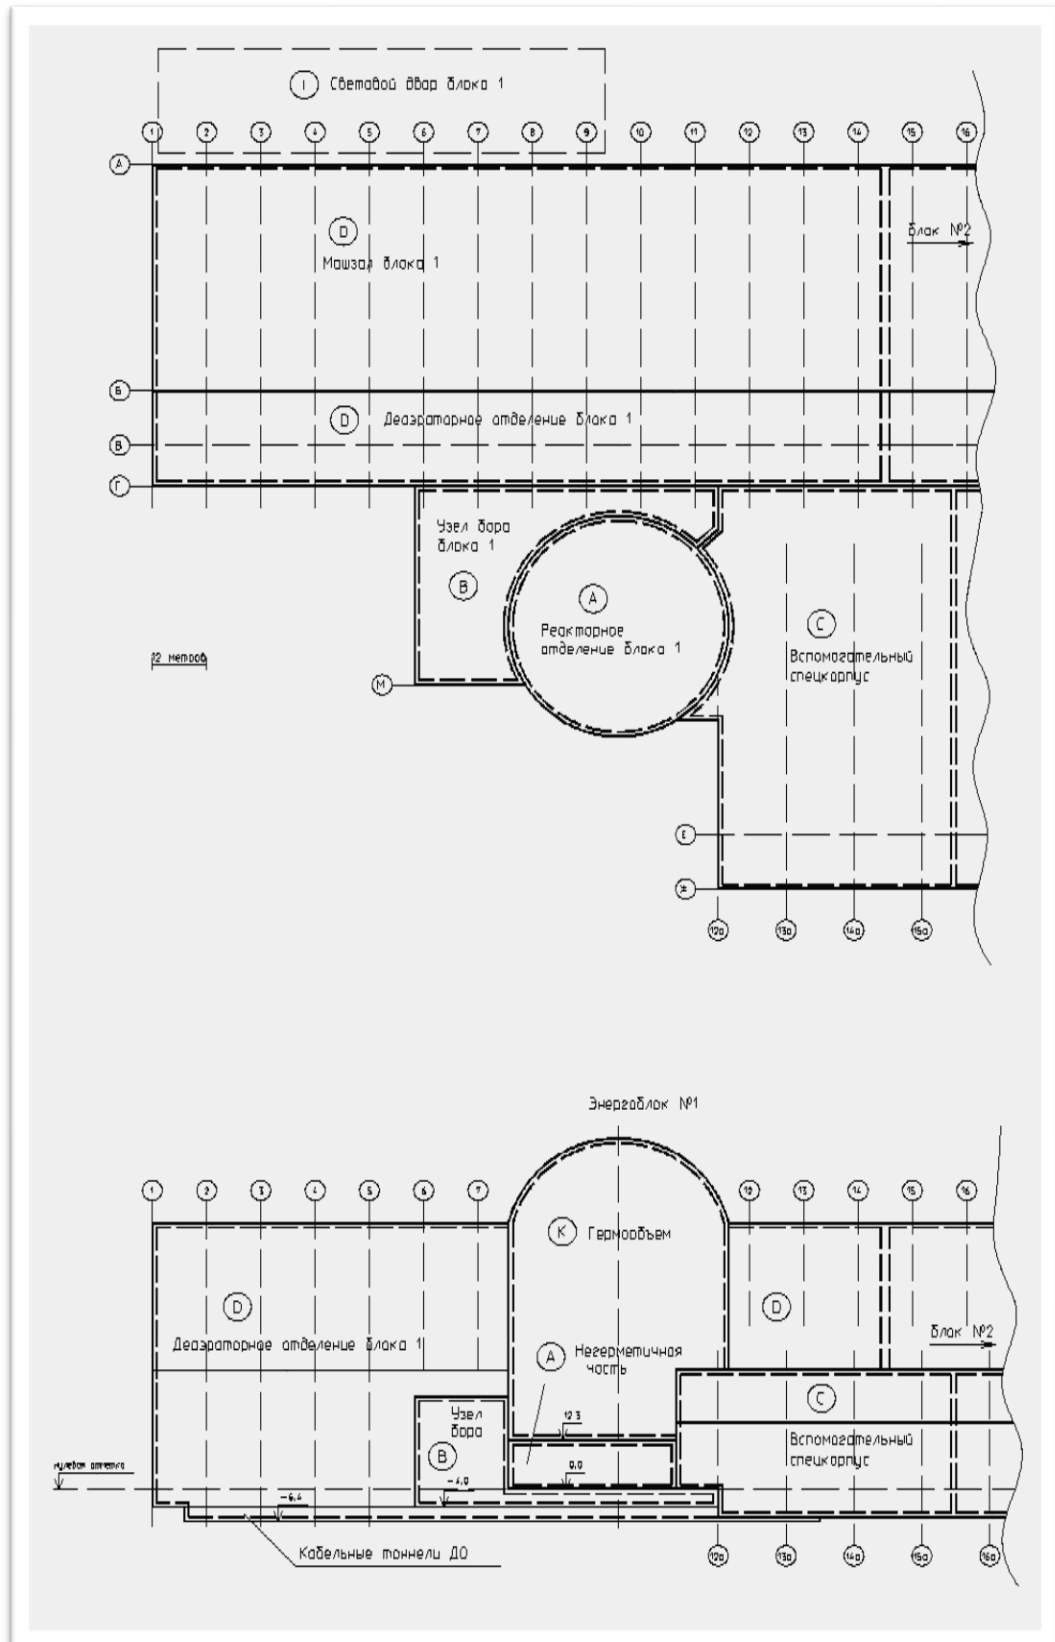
Layout of independent fire zones of the PNPP Unit 1 main building (top and side views)
